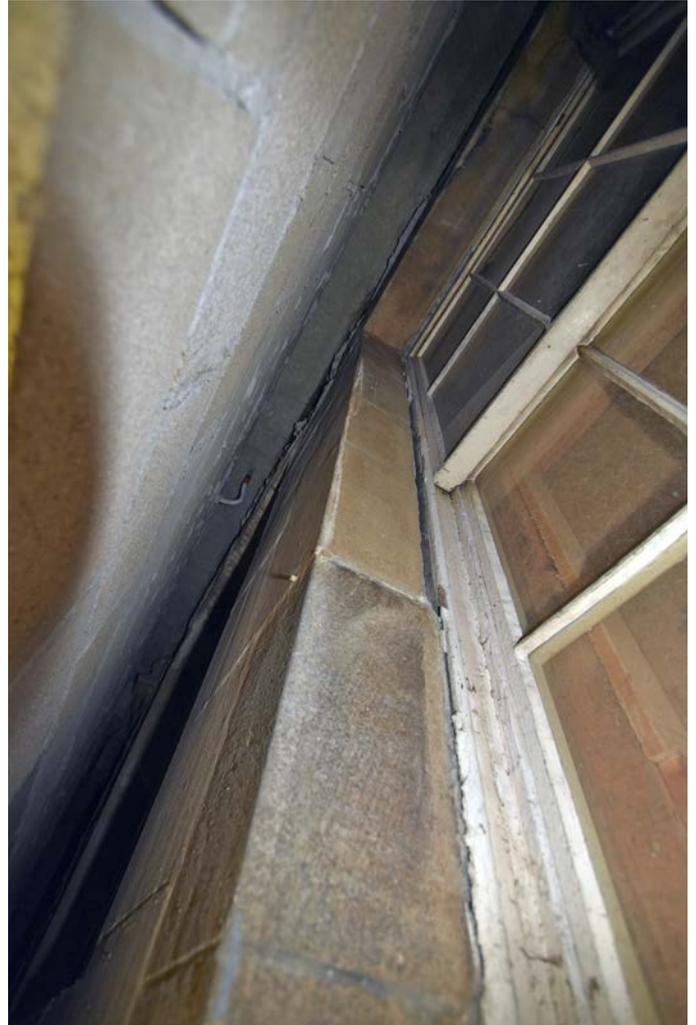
Detail of Window 4 exposed in Hole D between ground and first floor
